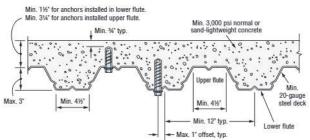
Installation of %"- and ½"-Diameter Anchors in the Soffit of Concrete over Steel Deck
